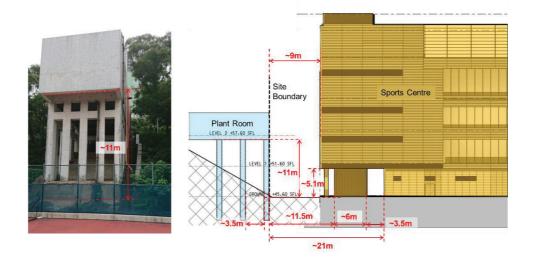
Schematic Section View of the Existing Plant Room and the Proposed Sports Centre under <u>Proposed S16A Application Scheme</u>
